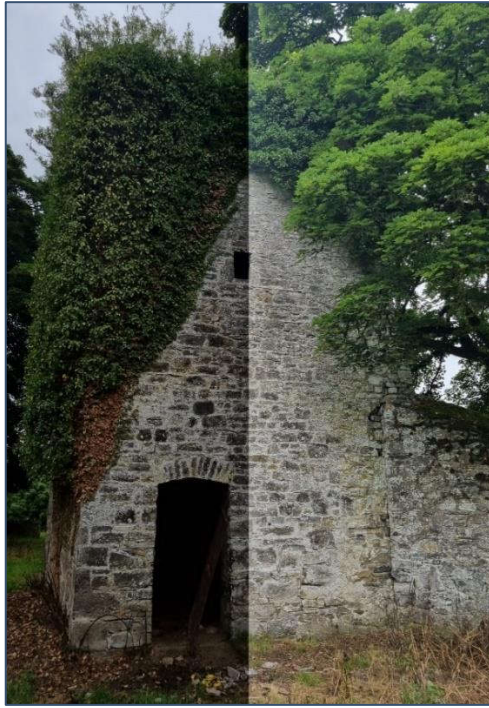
East facing wall of the castle tower with potential access through door and window
